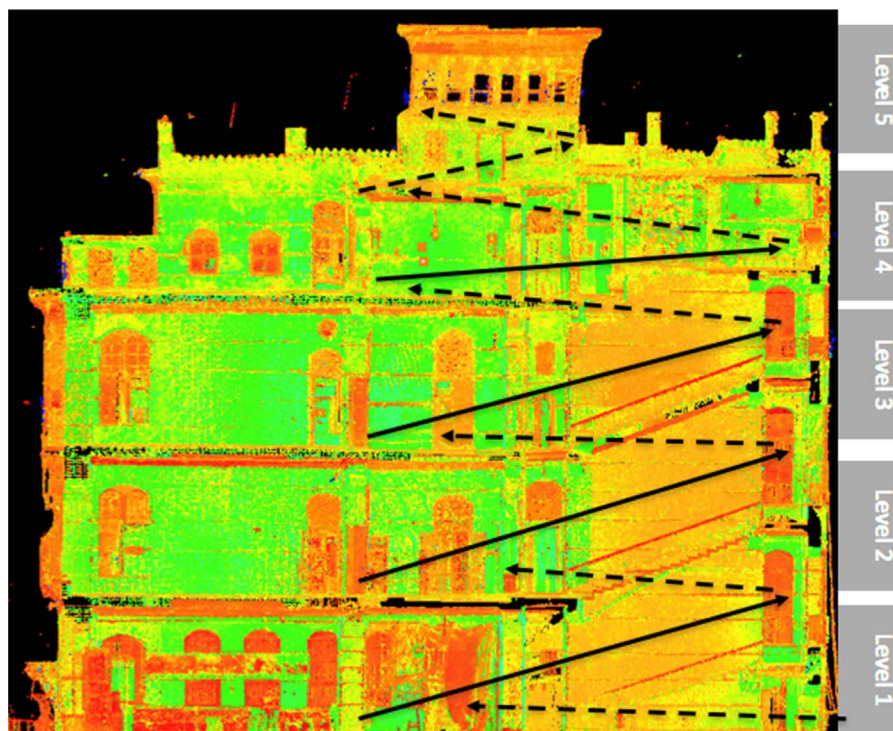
Section on the 3-D point cloud after using the staircase to link the floors’ scans and to register the scans.
